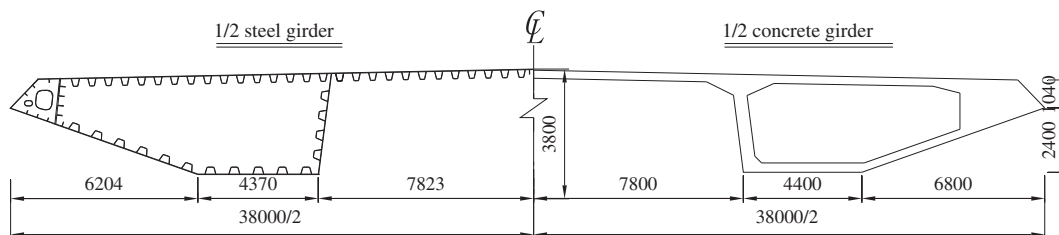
Cross sections of steel and concrete girder of Edong Bridge (unit: mm).
